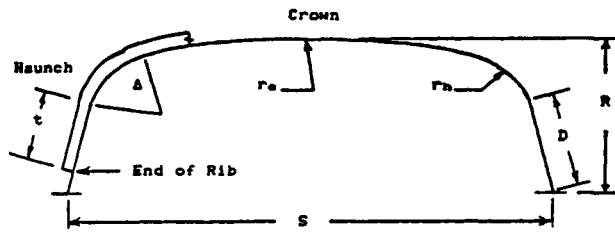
A Standard Terminology of Structural Plate Box Culvert Shapes
